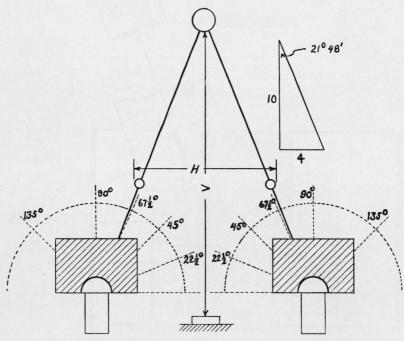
Schematic sketch for testing two pintle bearings.
